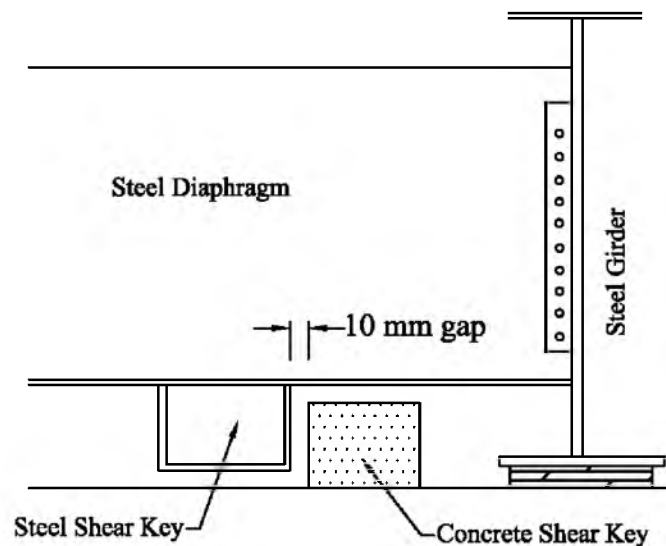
Location of concrete shear key and gap between steel girder and shear key
